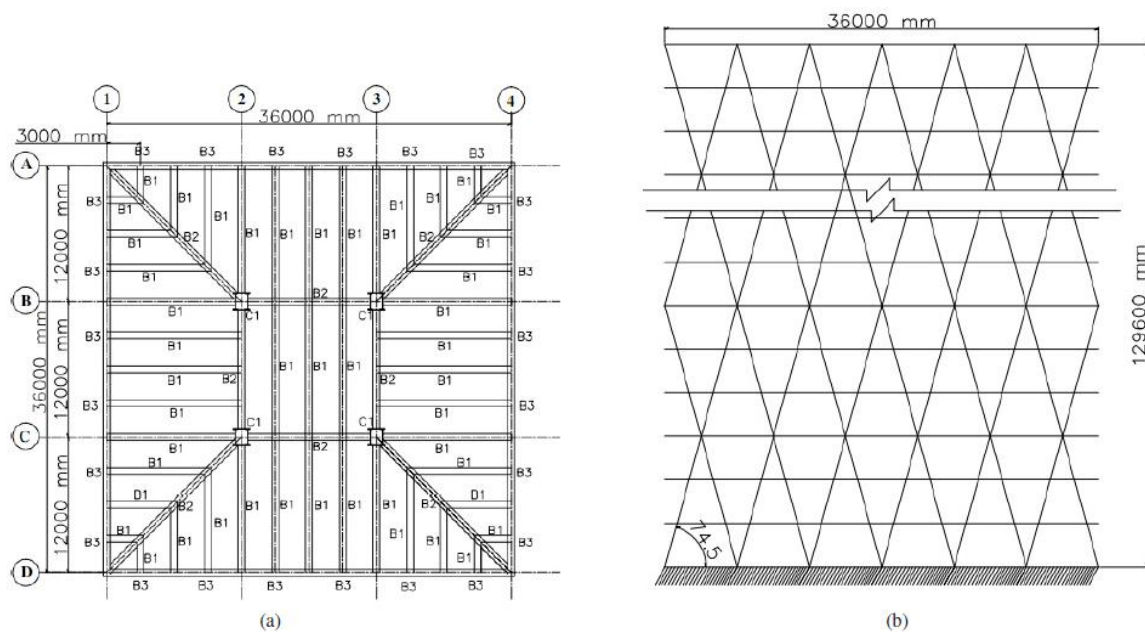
Typical (a) Floor plan (b) Elevation [3]
